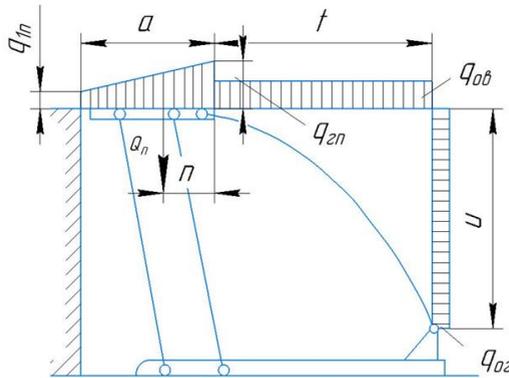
Loads on the supporting and protective elements of two or more supporting protective and supporting supports
